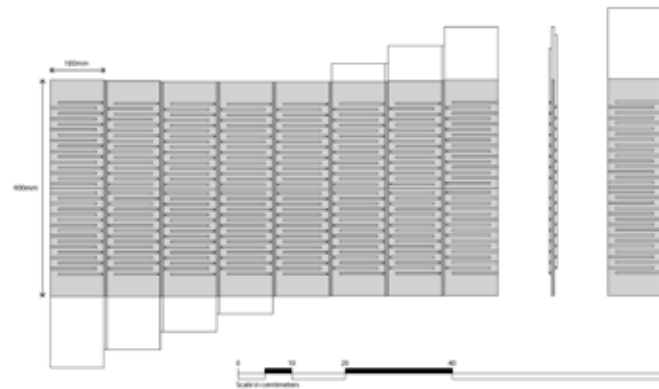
Sectional top view of the building system, with an exploded view of the key sheet between two layers of linear beams
